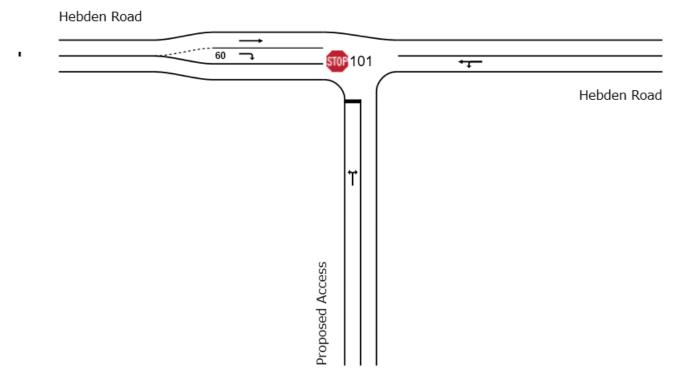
Hebden Road / Proposed Glendell Access Road Intersection Layout
